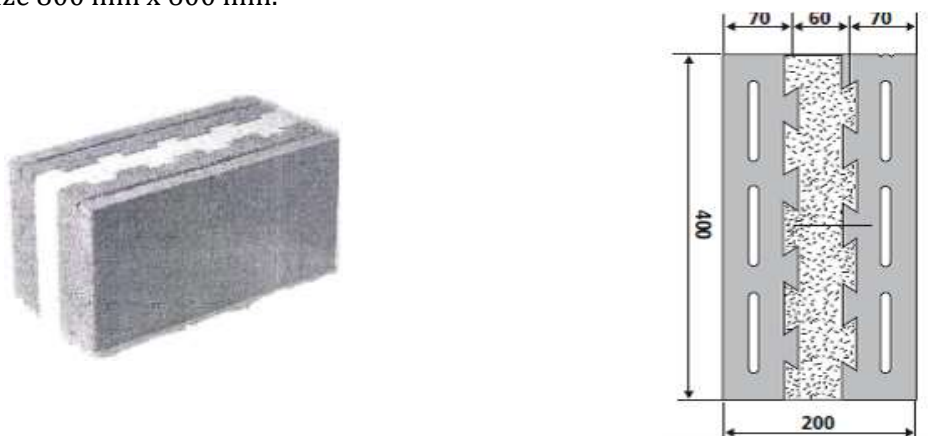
View of a block and a sectional plan of a Kool Tile.
